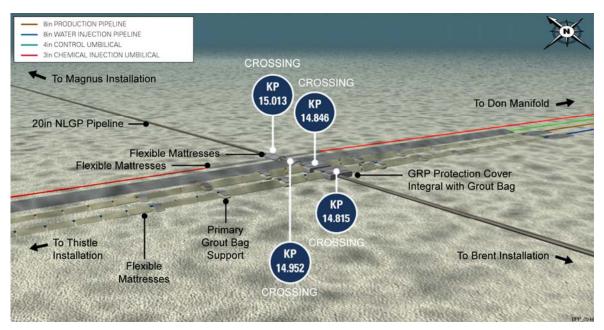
Pipelines and Umbilicals Layout at NLGP Crossings
